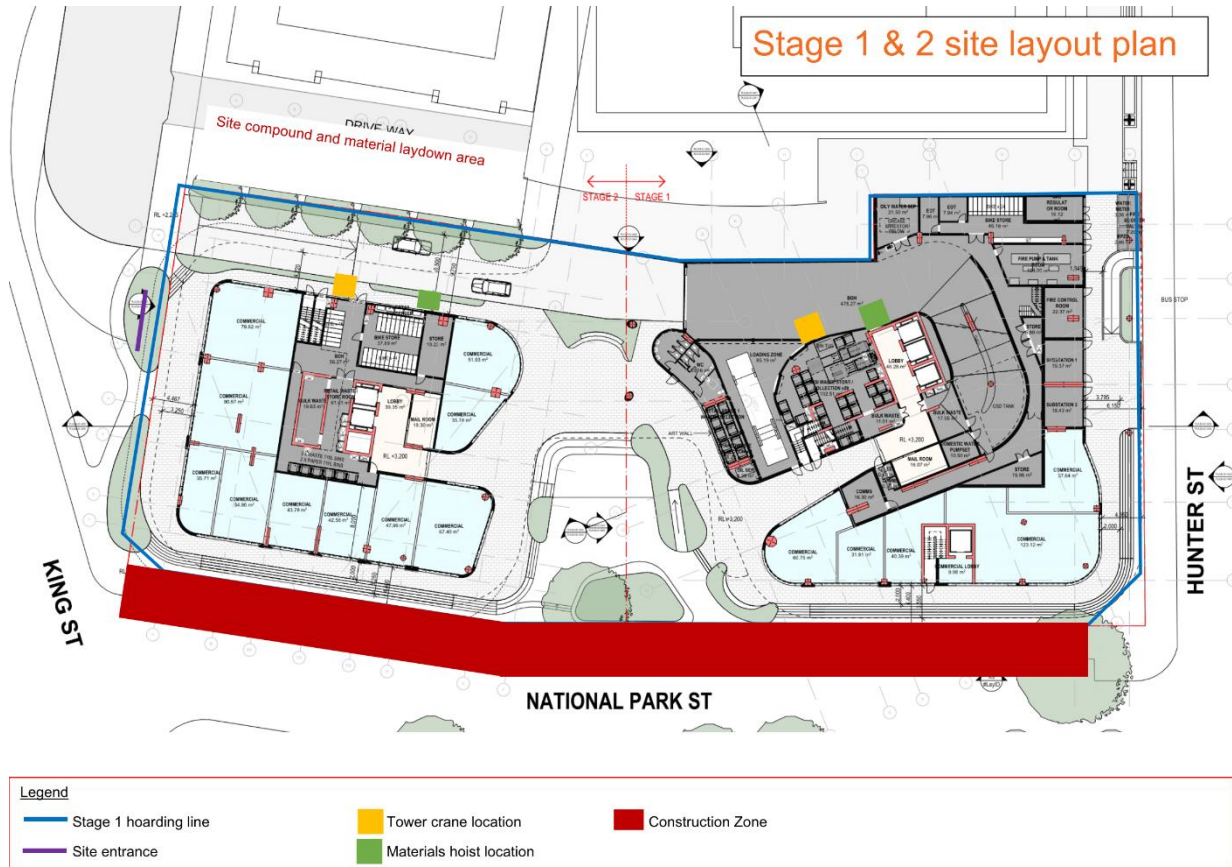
Stage 1 & 2 Proposed Site Layout Plan.
